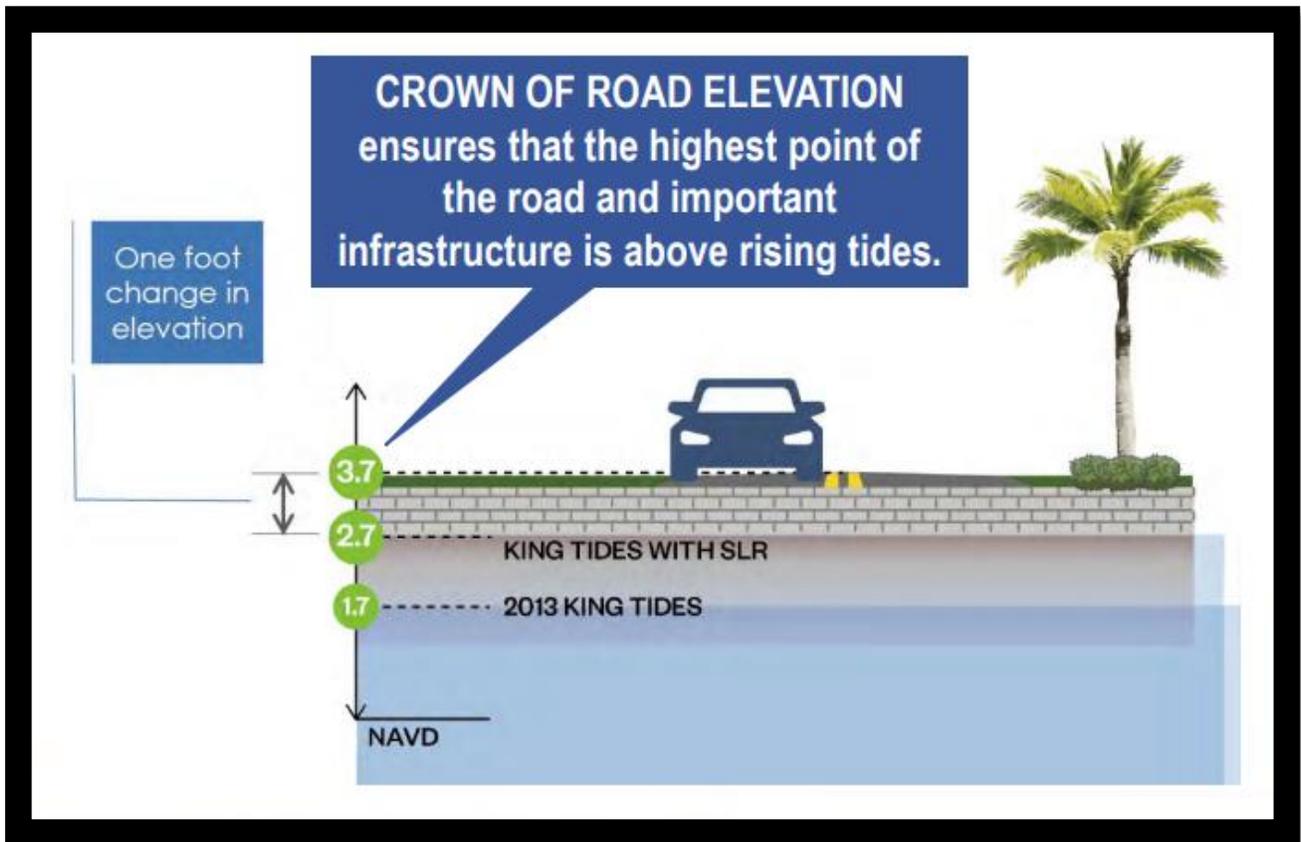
Example of Road Elevation Strategy for Miami Beach, Florida (Jacobs 2020)
